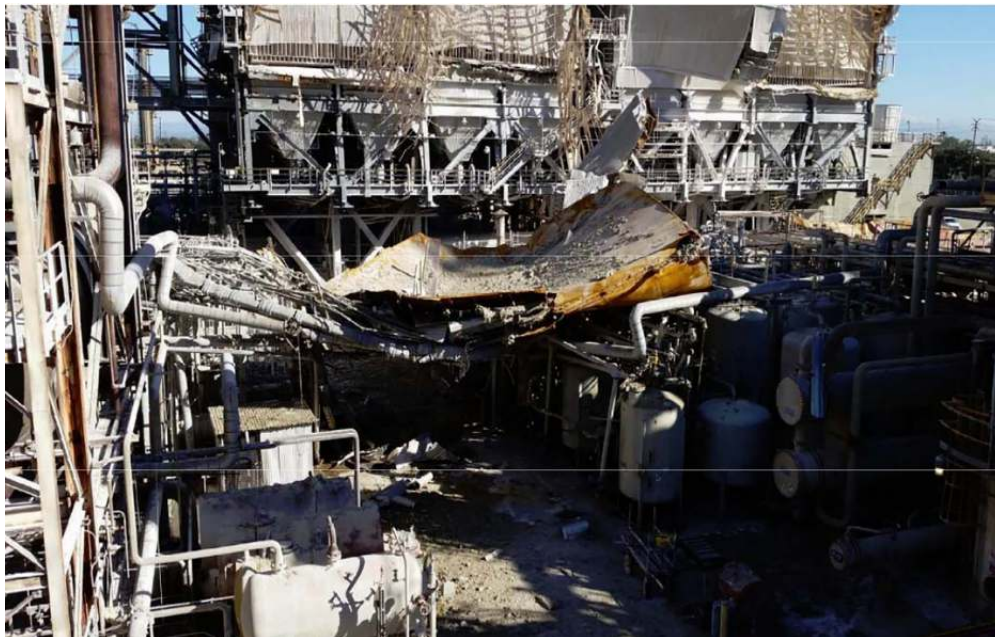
A photograph showing the ESP and damaged piping (source: www.csb.gov).
